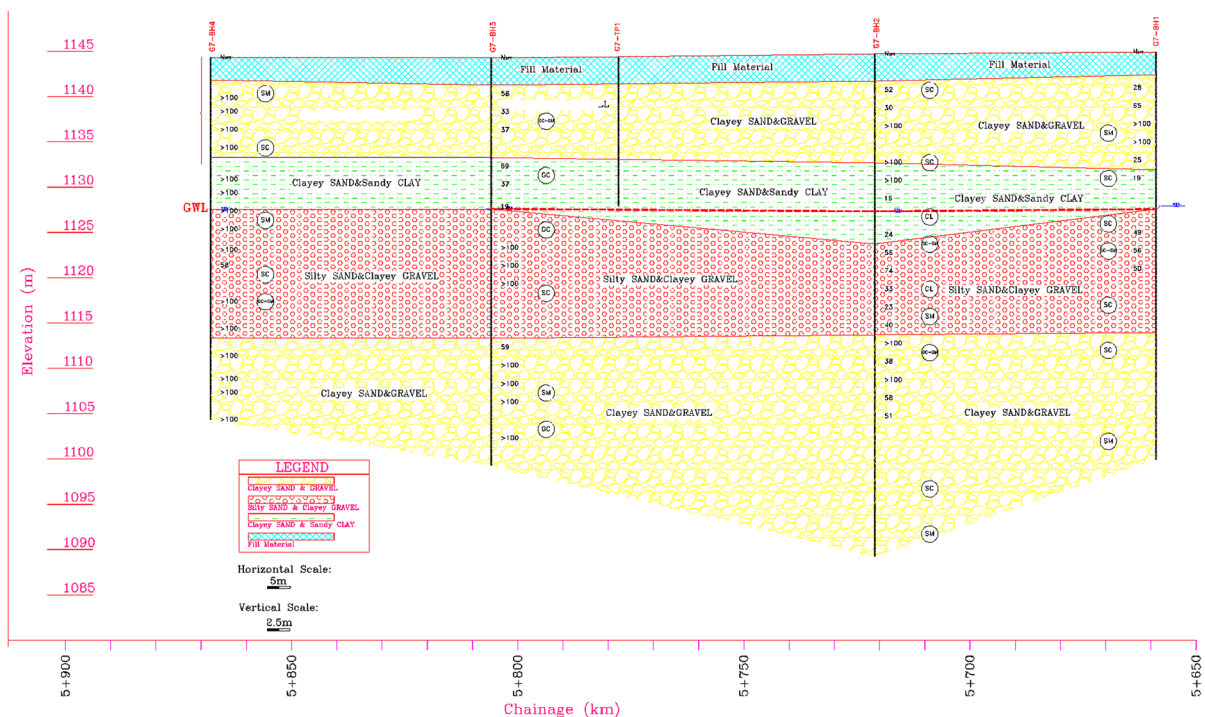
Geotechnical longitudinal profile and ground water table along F6 Station and link tunnel
